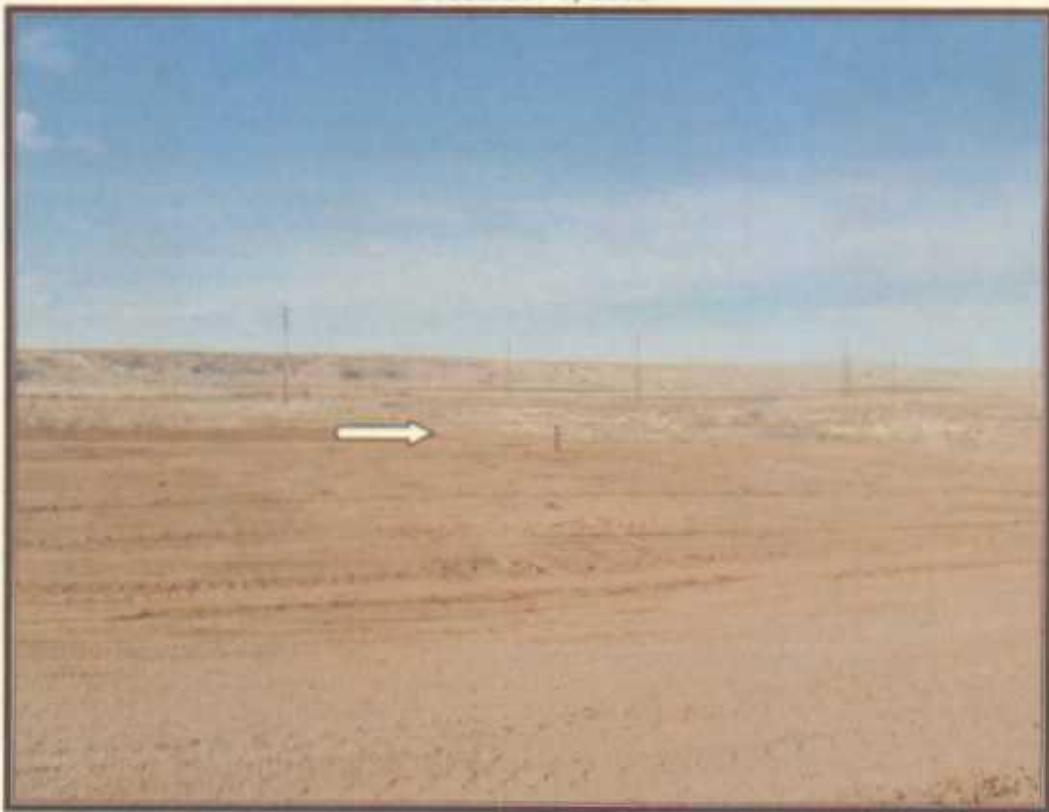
View to the west showing completion of backfill activities, final grade and MW-7.
